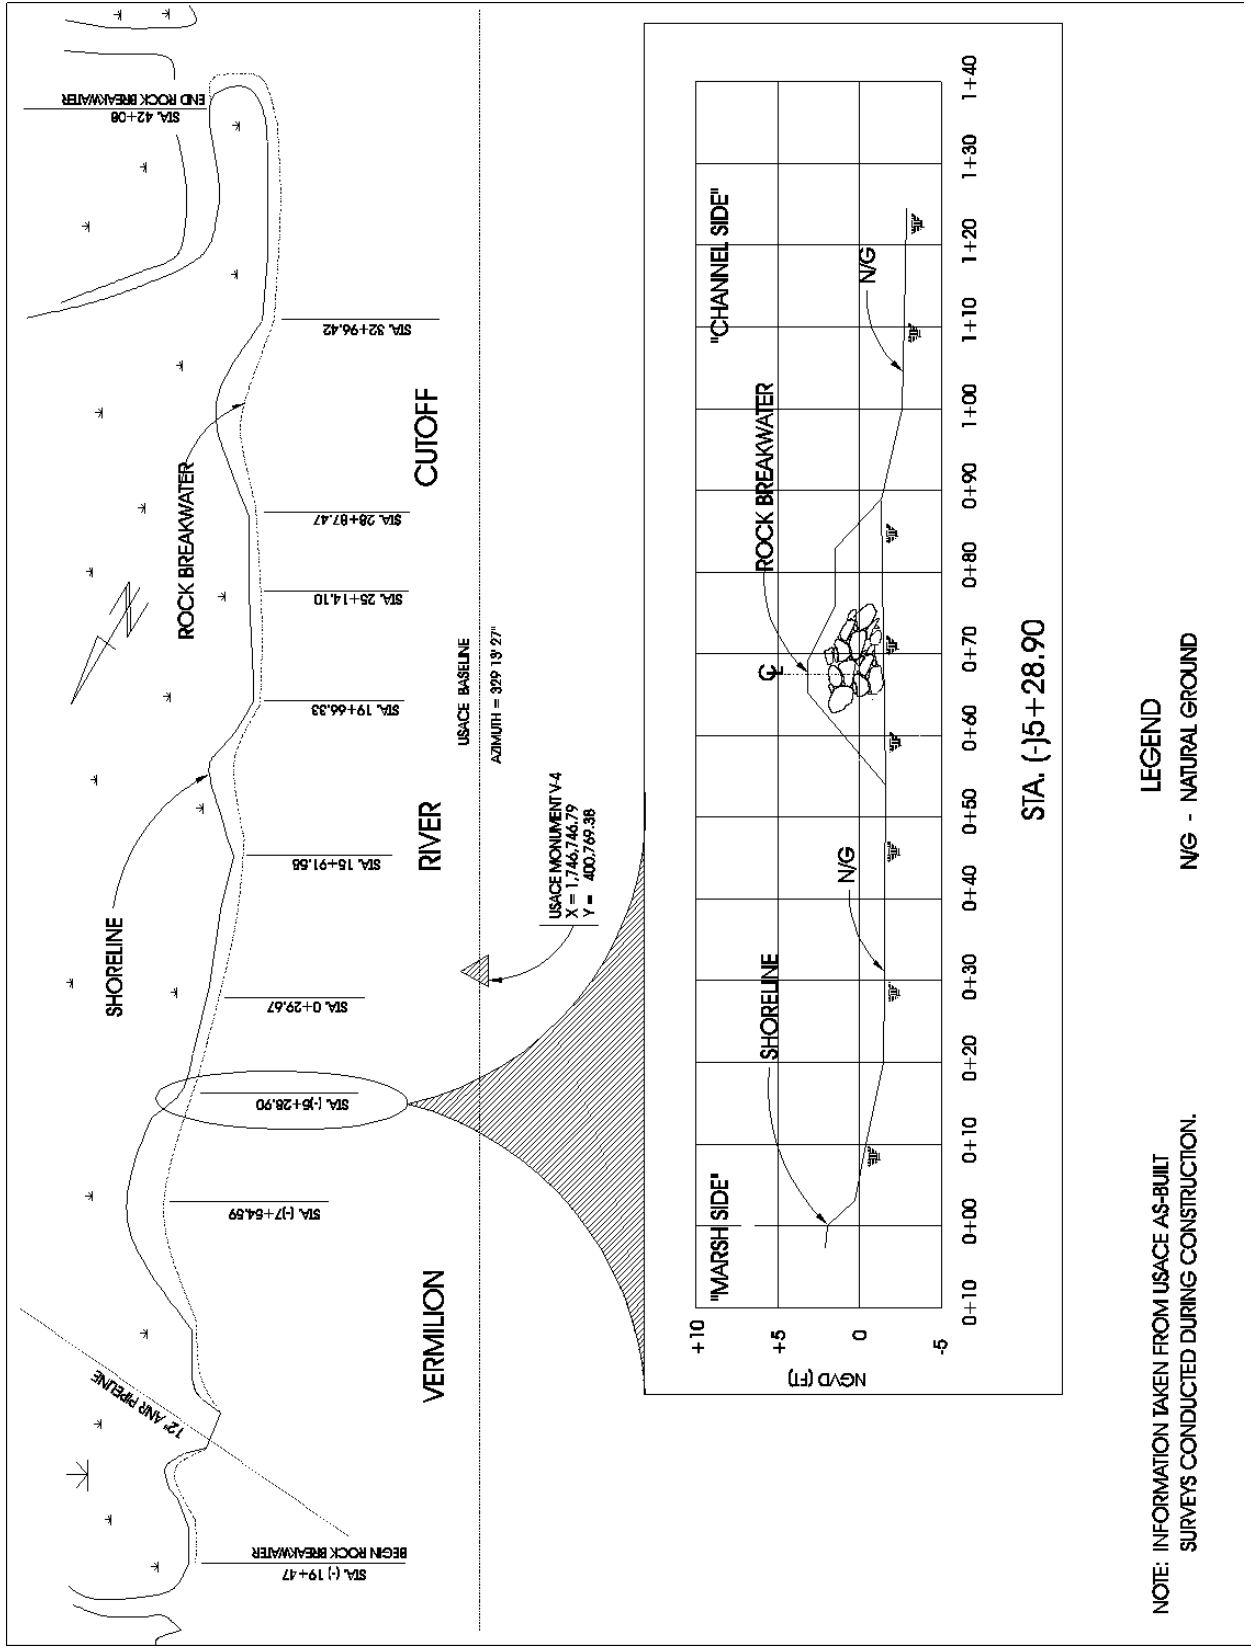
Plan and cross section showing location and elevation profile of station (-)5+28.90 in as-built survey (data from USACE 1996).
